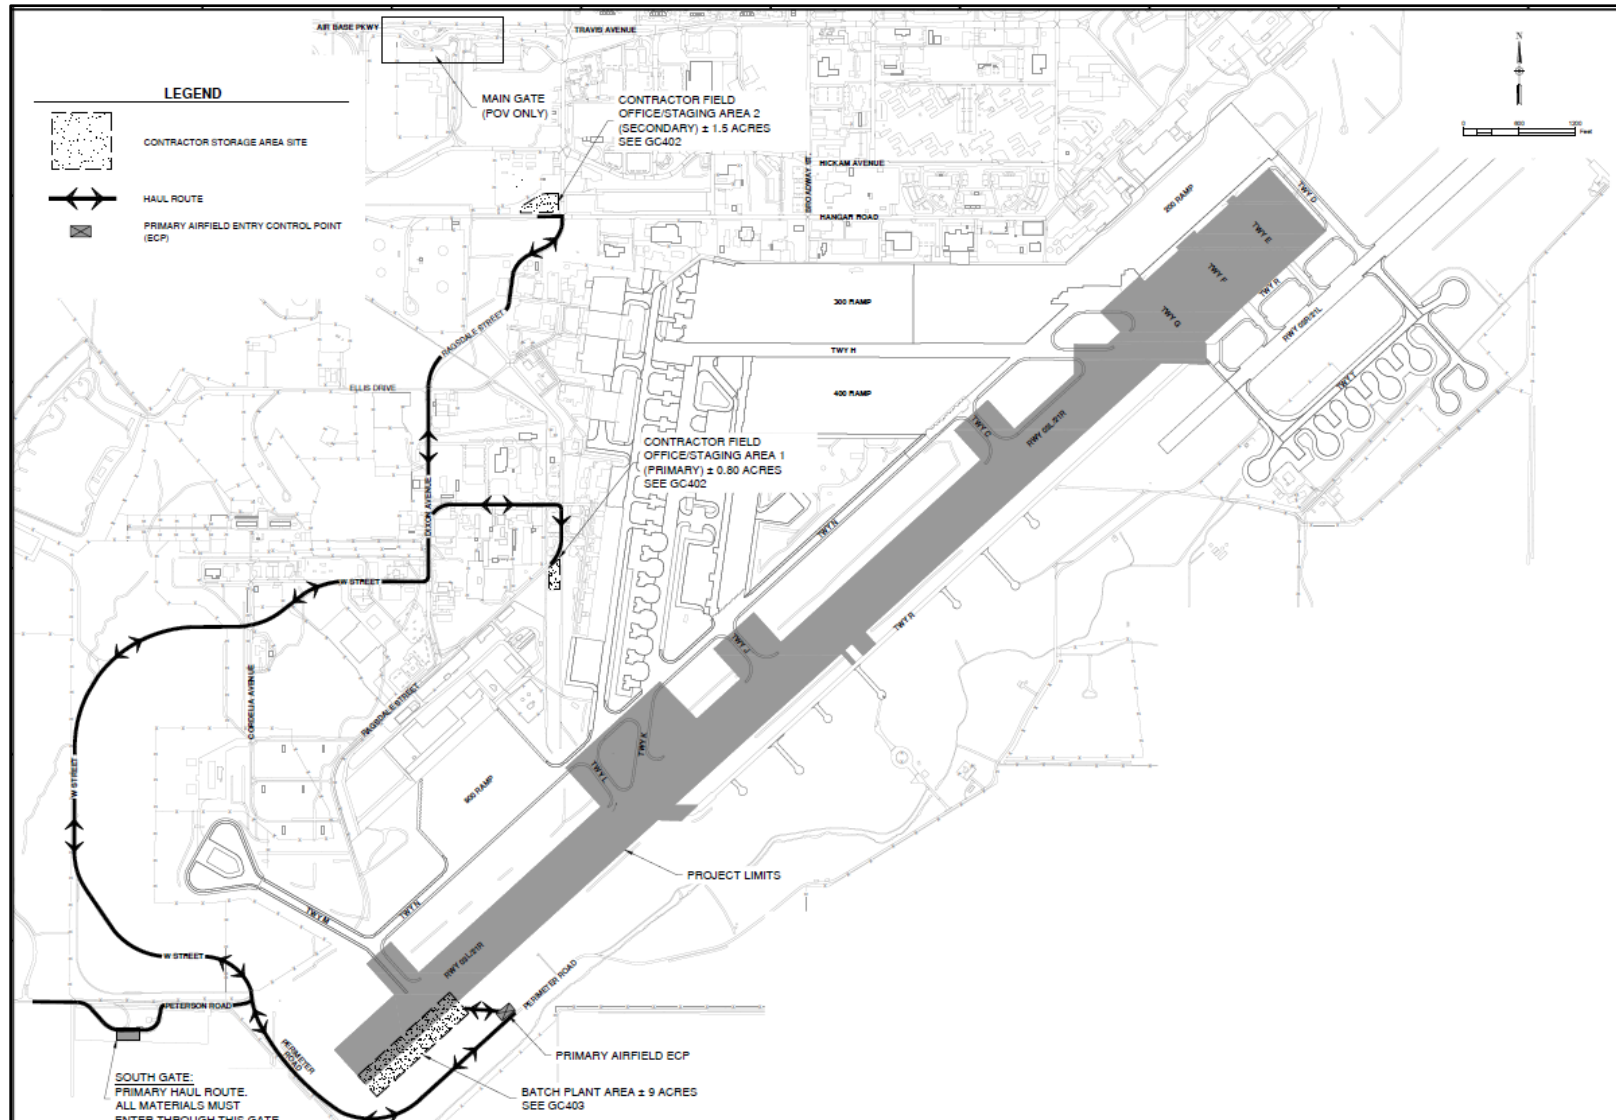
Temporary batch plant location, staging, access, and haul routes under Alternative 1
